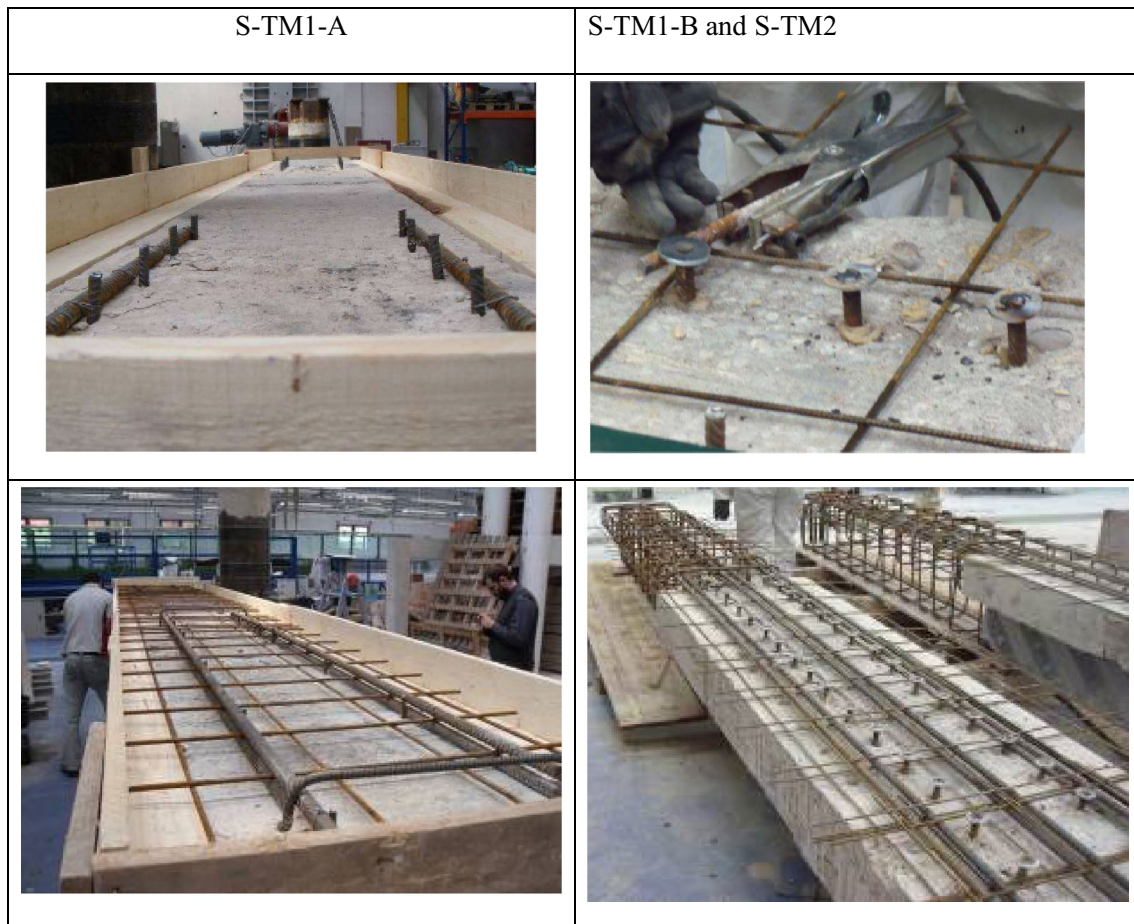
Retrofitted beams: RC slab steel longitudinal reinforcement, connectors for retrofitted beams S-TM1-A (left), S-TM1-B and S-TM2 (right)
